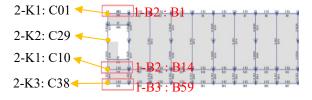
Structural elements that have not been able to withstand the tsunami loads
